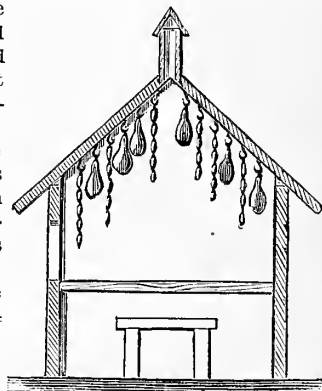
SECTIONAL VIEW OF SMOKE HOUSE.
